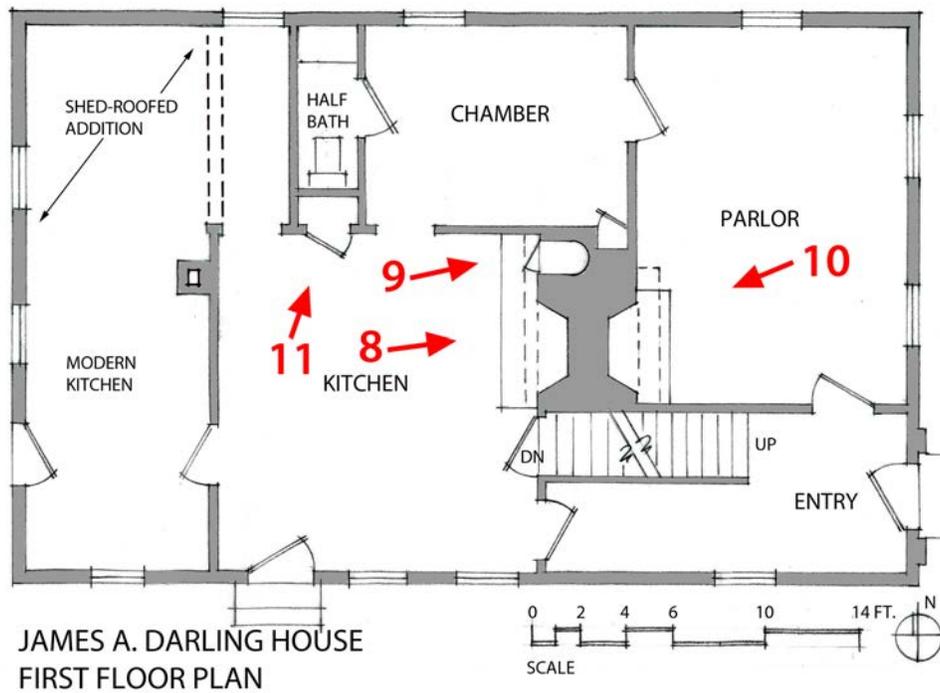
First floor plan, James Alexis Darling House, 1932 Litchfield Turnpike, Woodbridge, CT with photograph key.
